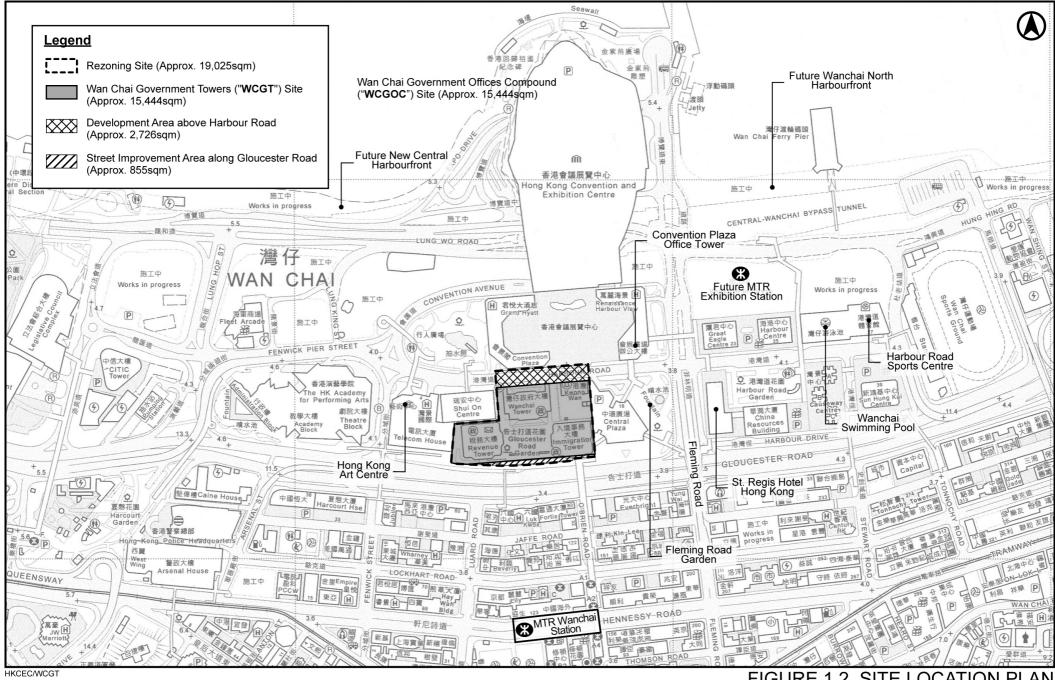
SITE LOCATION PLAN SCALE 1 : 5,000
